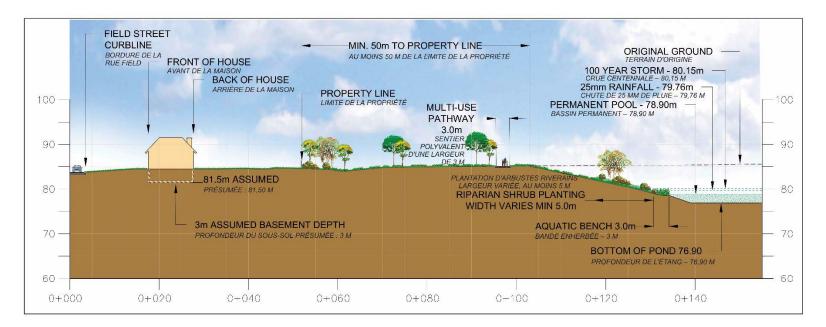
Cross Section B-B' (Preferred Alternative)
